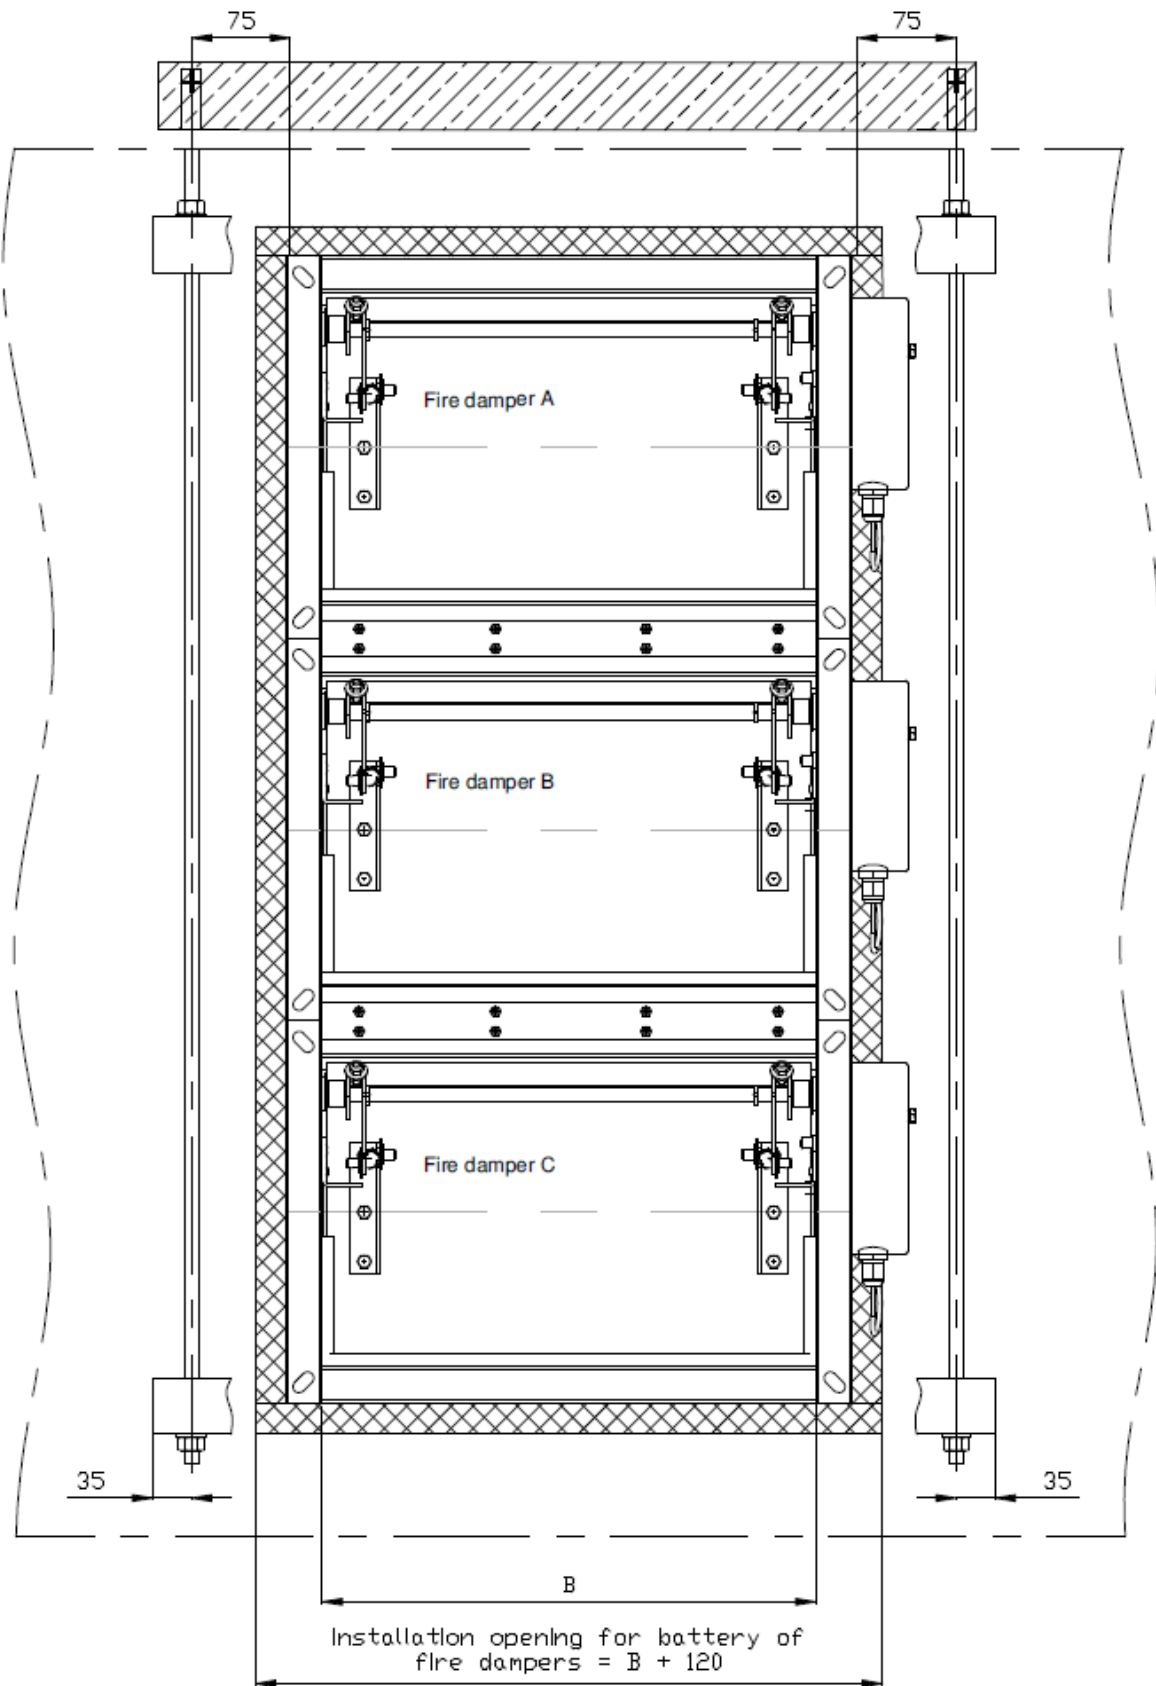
Installation of a battery consisting of three fire dampers KWP in vertical arrangement in rigid barrier – front view.
